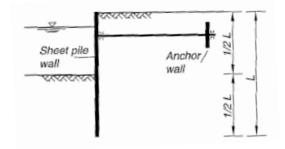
Principle of a anchored sheet pile wall with anchor wall
